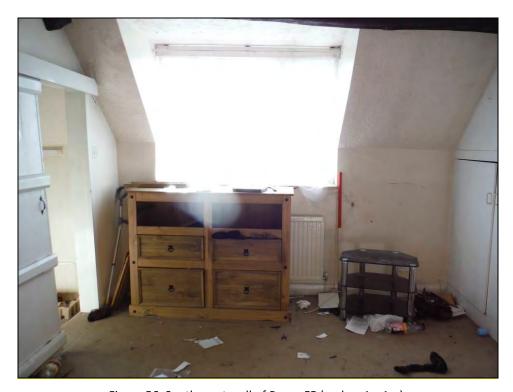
South-west wall of Room F5 (scale = 1×1 m).
